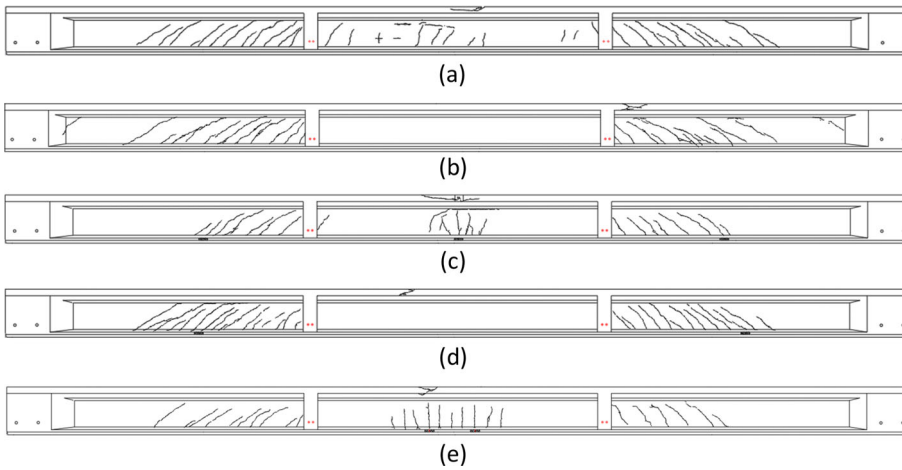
Crack pattern of the tested girders after failure (Table 1): (a) G05, (b) G06, (c) G07, (d) G08, and (e) G09.
